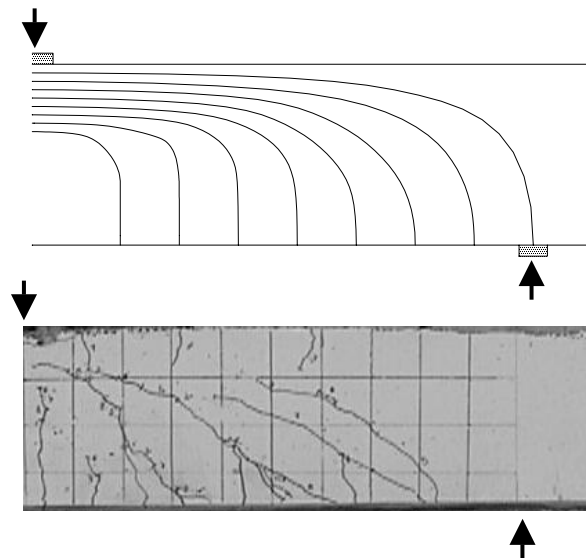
Principal compressive stress trajectories in an uncracked beam and photograph of a cracked reinforced concrete beam.
